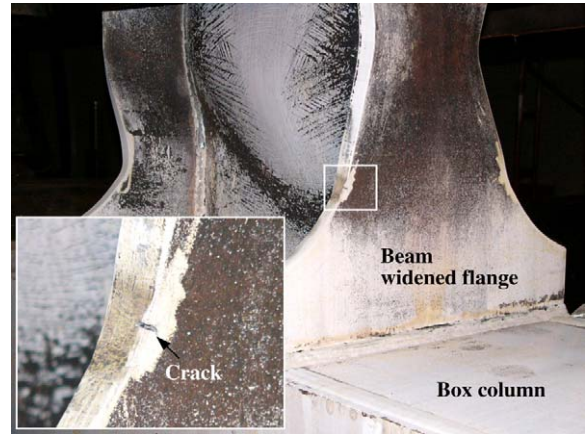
Minor cracking on the widened flange of specimen W10-L1 at 5% rad story drift angle.
